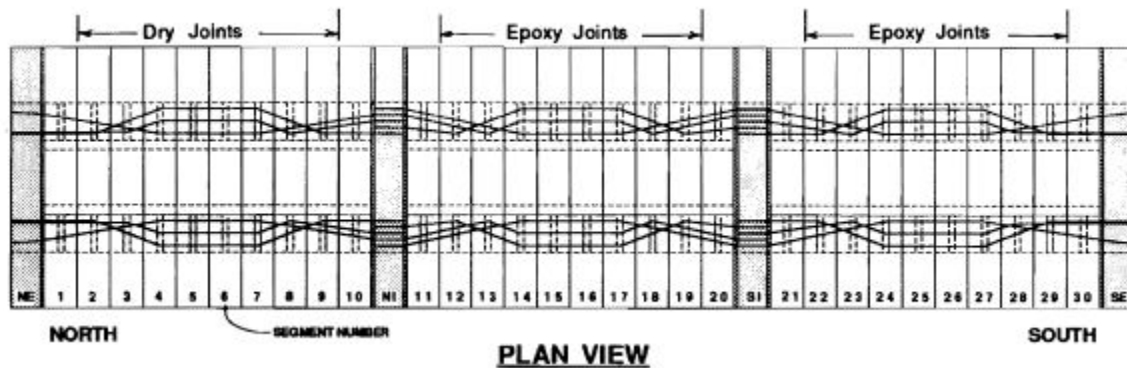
Plan View of Girders Tested by MacGregor (1989)
